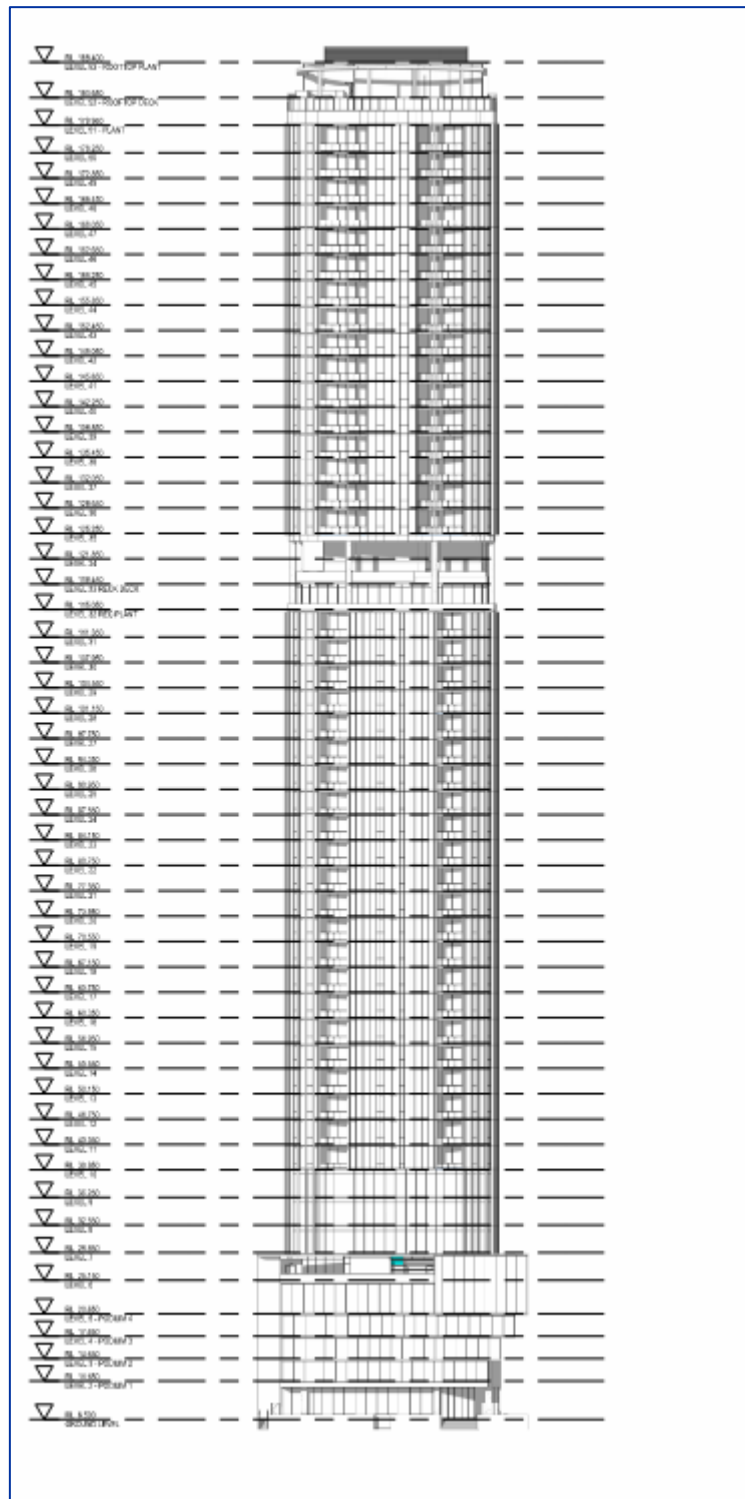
North Elevation of East Tower facing Stanley St, Woolloongabba
